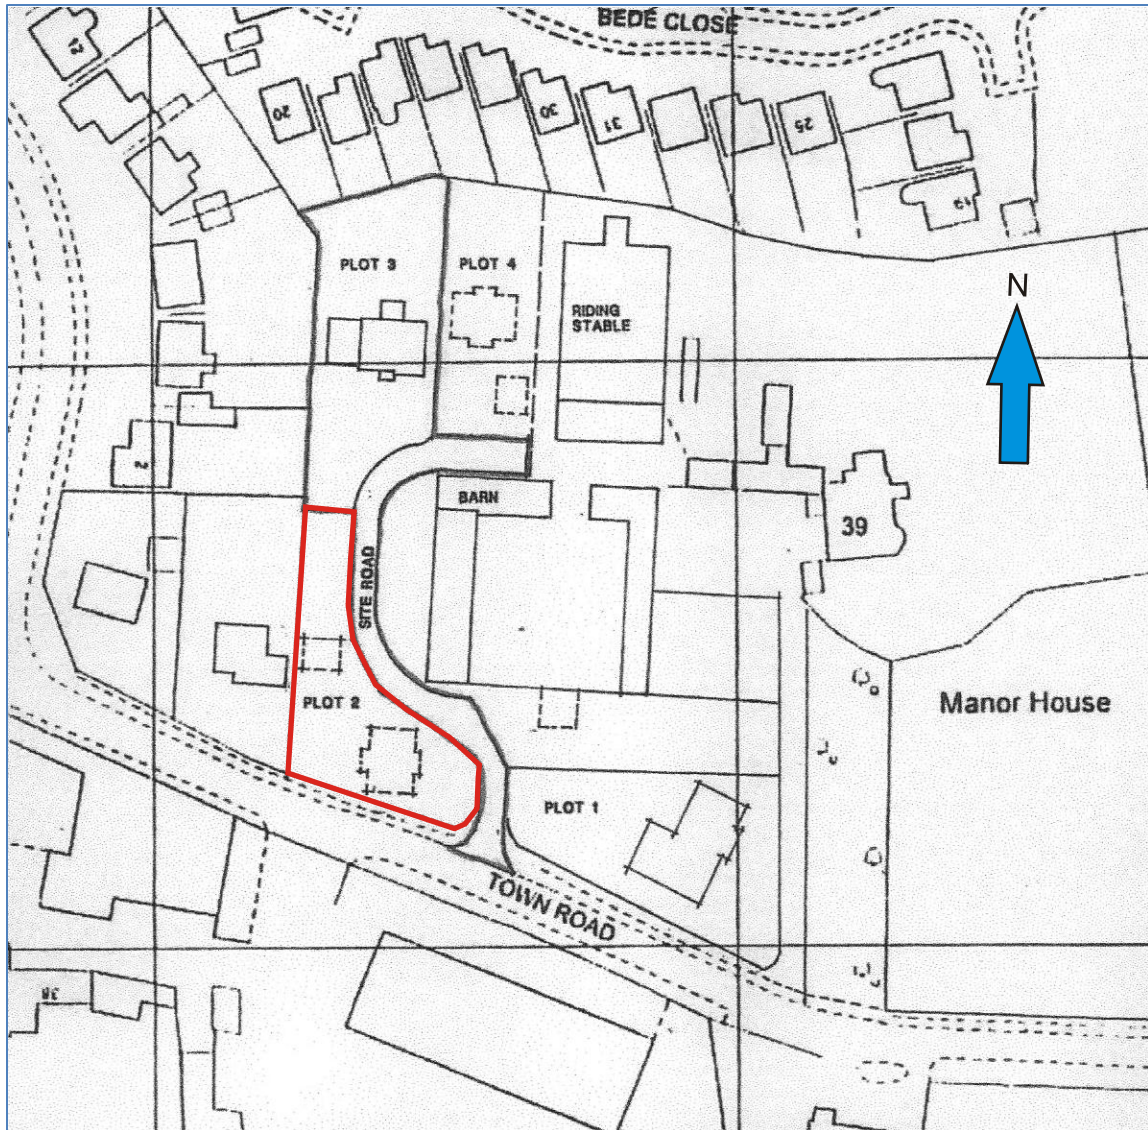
Site location showing the layout of Plot 2 at an original scale of 1:1,250 (extract from Architects plan). The site boundaries are shown in red.
